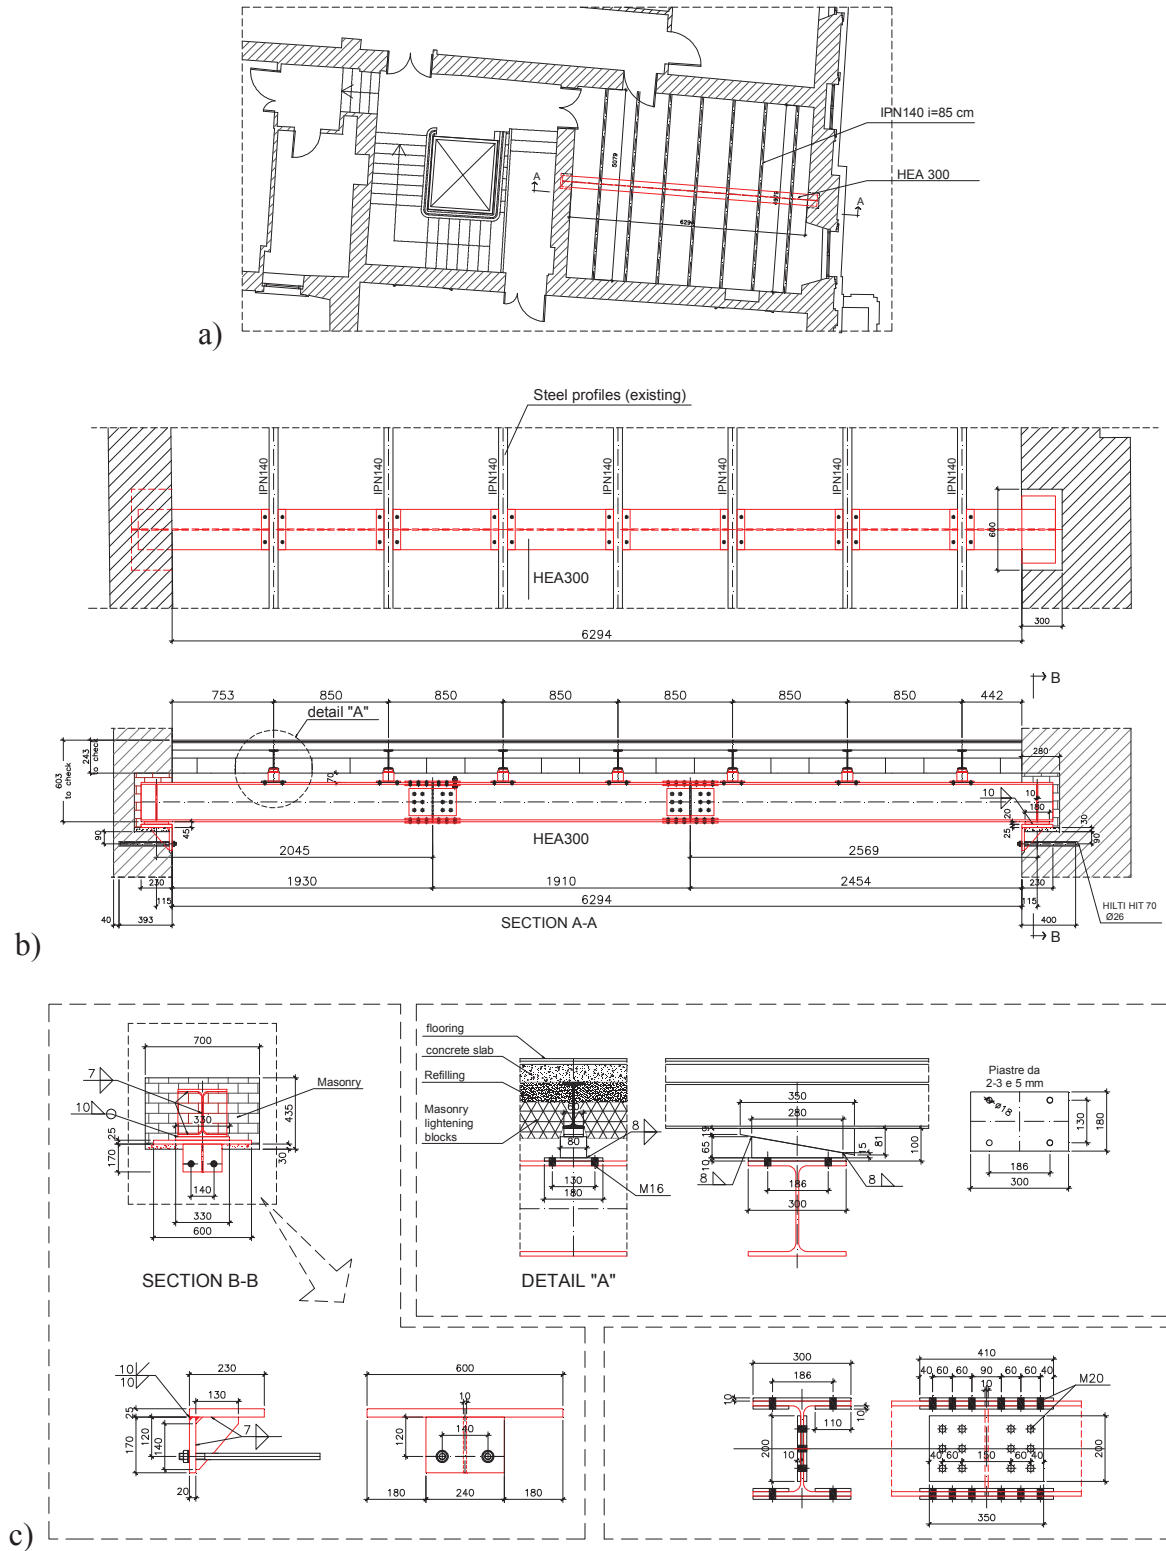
Local strengthening of horizontal floor: a, b) general scheme and sections, c) executive drawings.
